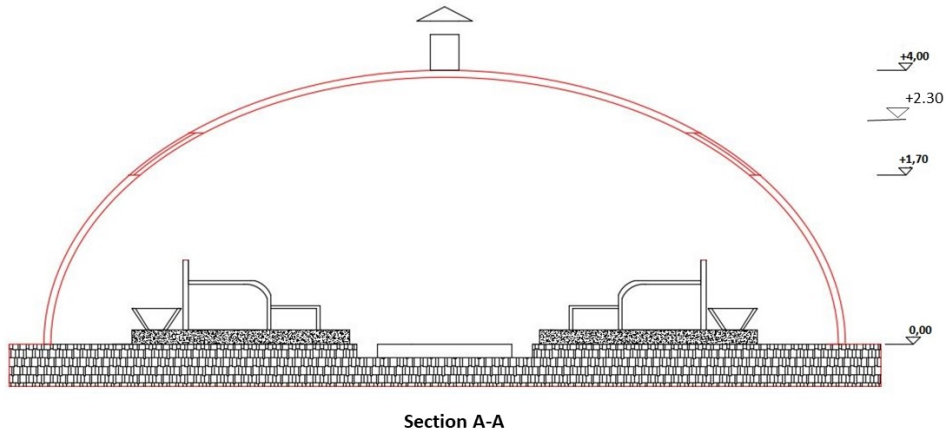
the sectional view of 20-headed prefabricated barn with lightweight concrete
